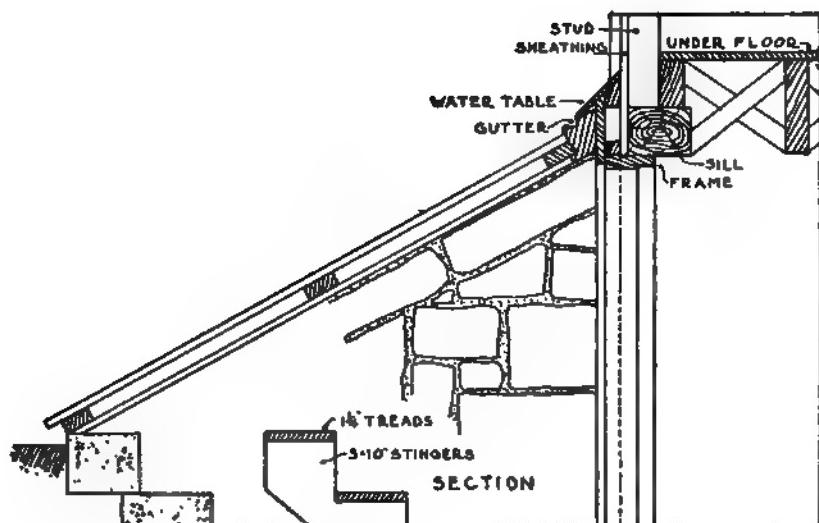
Outside Cellarway-Bulkhead in Brick Wall.
